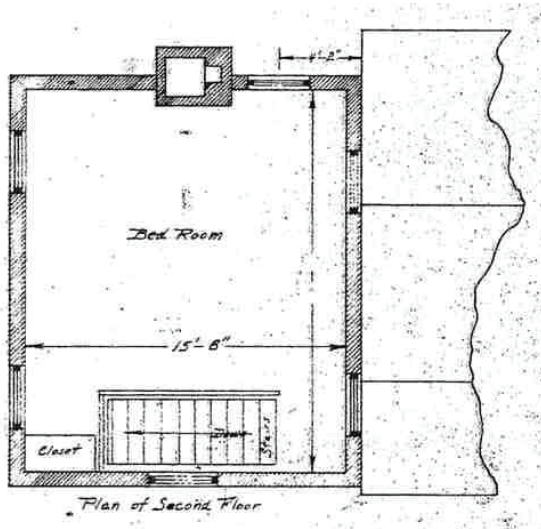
Second floor plan of Kitchen building from 1922 "Repairs & Improvements" to Assistant Keeper's Dwelling.
